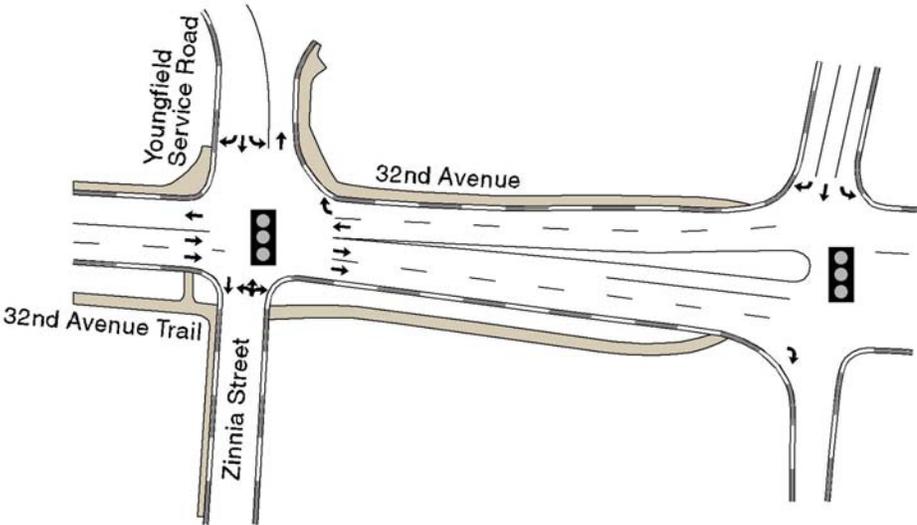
32nd Avenue/Cabela Drive/Zinnia Street Intersection Detail
